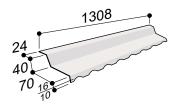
Milano ridge flashing A installed along each side of the ridge
